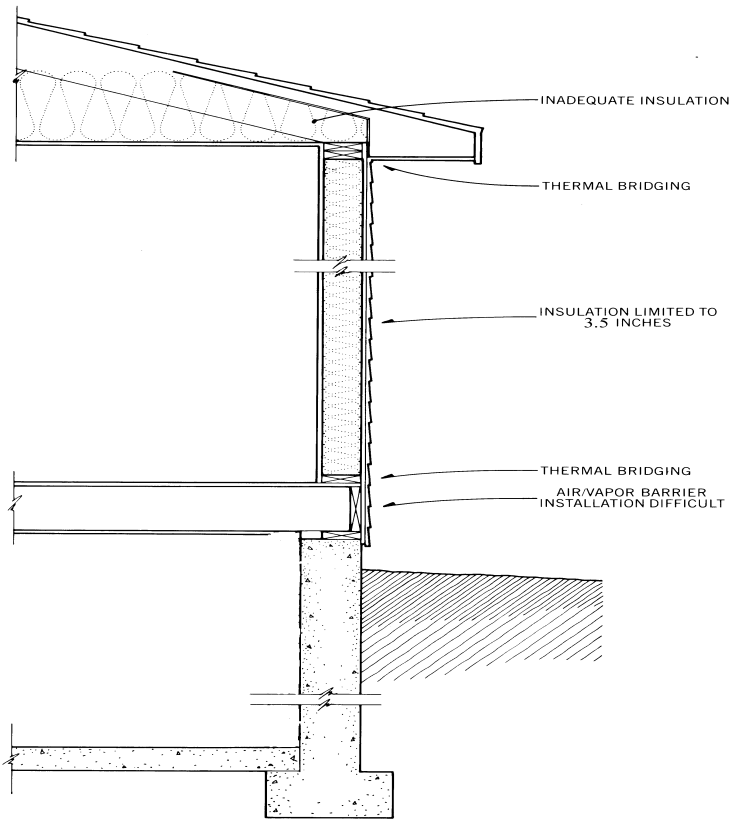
provides a cross section of the basement foundation. It has plain concrete walls, a concrete floor and no ceiling drywall. The garage is not insulated. The basement and garage construction materials are included in the SH-materials inventory. It was assumed that the owner would fit out the basement within the first year after purchase, adding drywall to the foundation walls and ceiling, and vinyl tile to the floor. Because this activity takes place soon after construction, the primary energy and GWP were included in the pre-use phase inventories.
